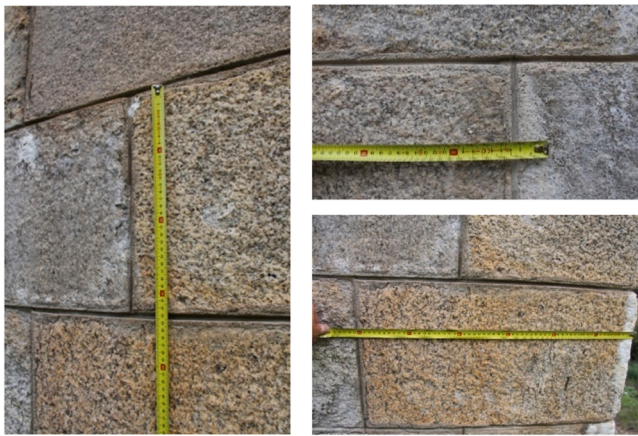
Masonry details at the base of the first pier from the northern side of the viaduct.
